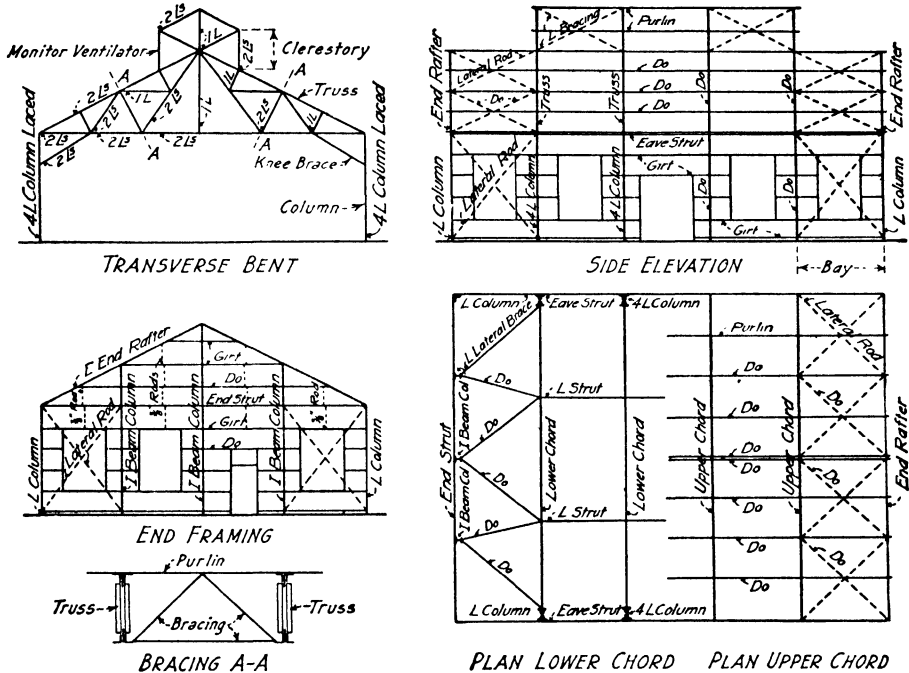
FRAMEWORK FOR A STEEL MILL BUILDING.
